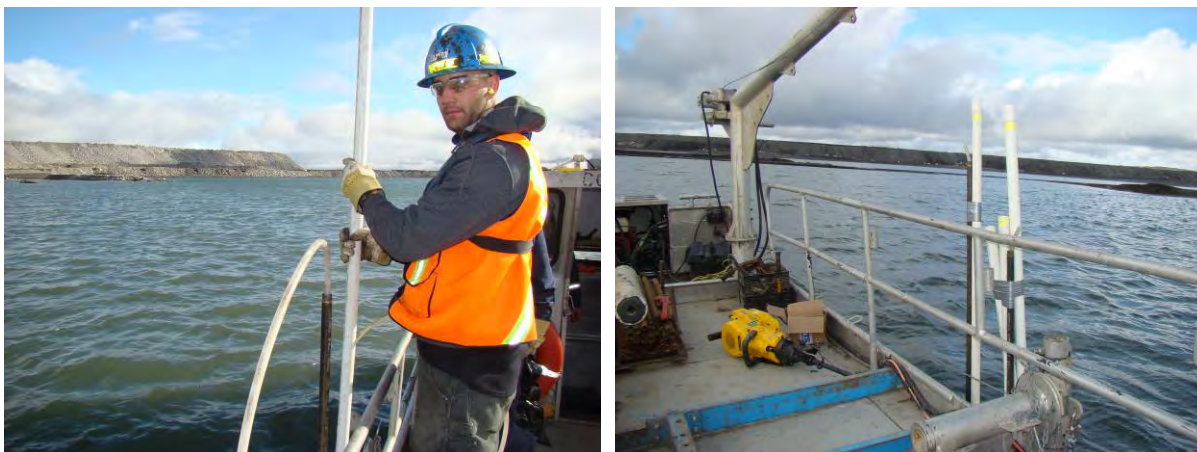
Installation of piezometers from the ConeTec barge. Photo on the right shows the completed piezometer nest.
